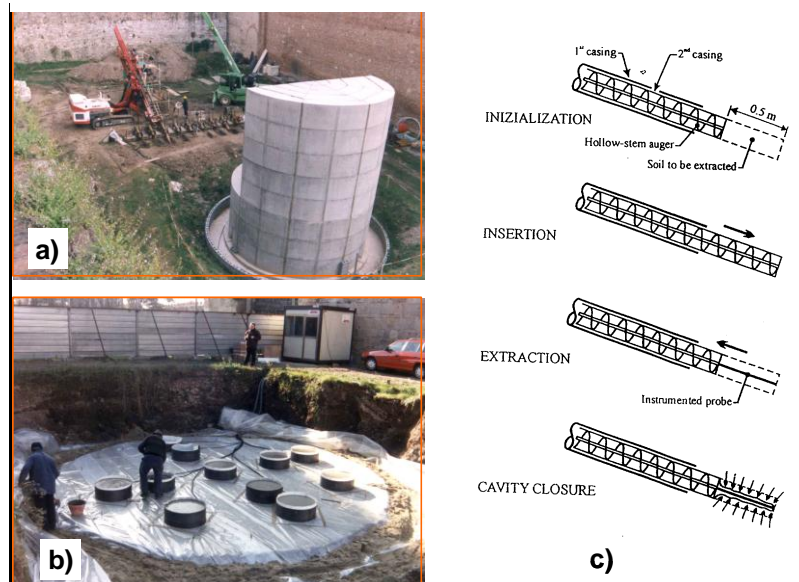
a) The underexcavation trial field. b) Installation of pressure cells on the foundation plane. c) The underexcavation procedure finally developed
